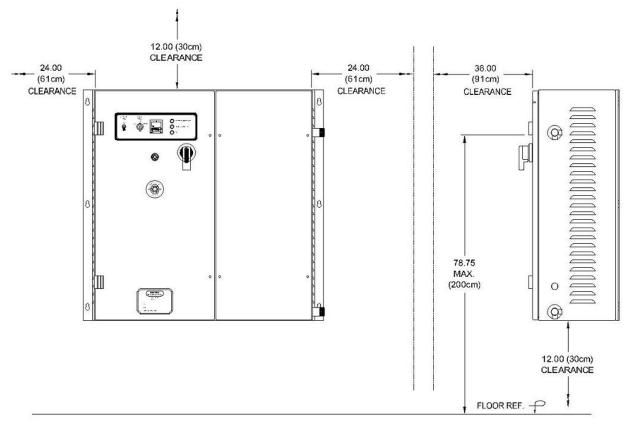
Clearance Dimensions for Wall-Mounted Units (72kW Model Shown)
